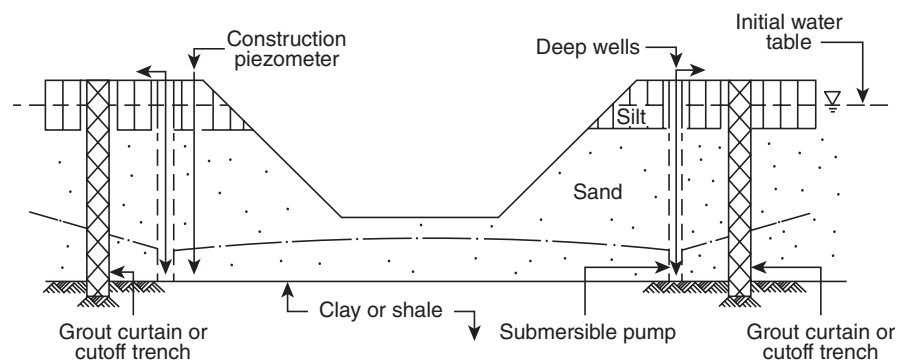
Grout curtain or cutoff trench. (UFC-3-220-5)
